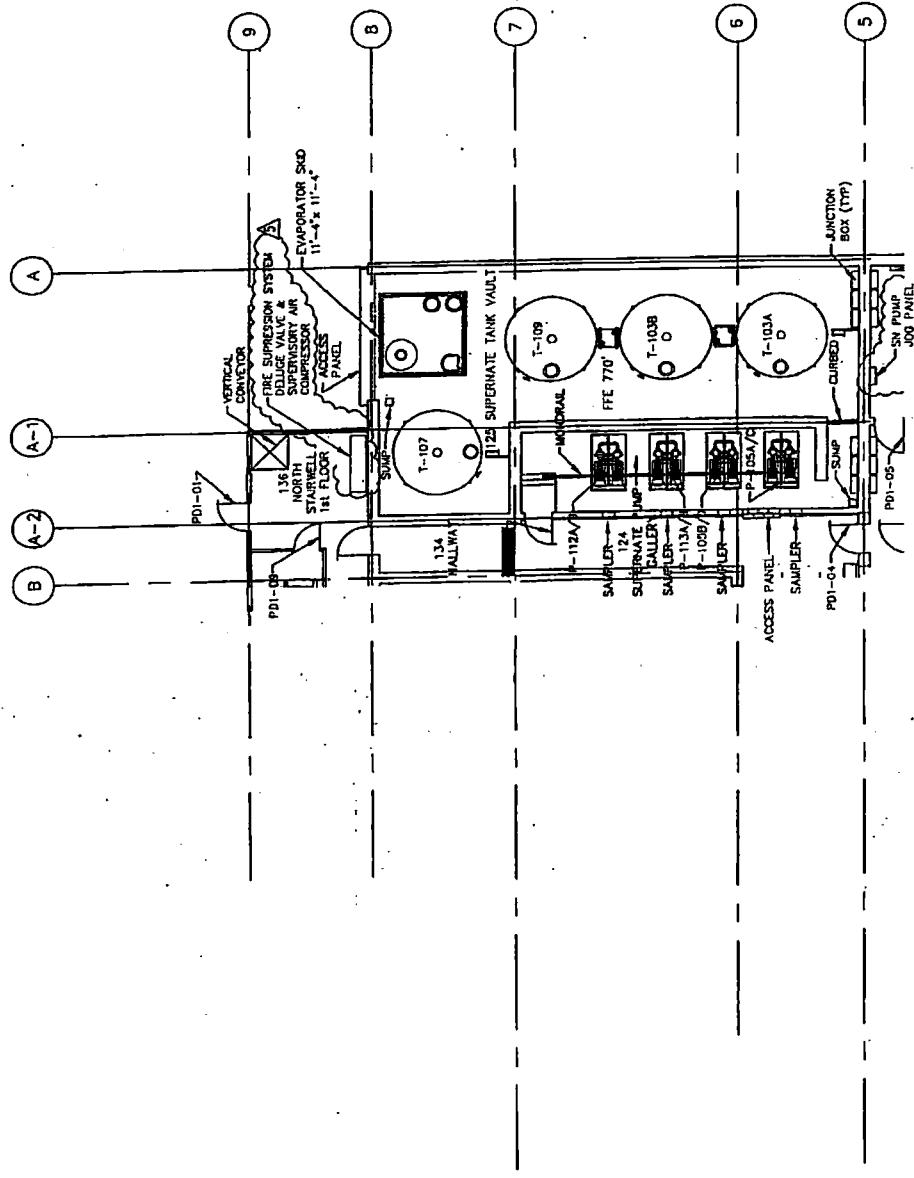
, 1-3, and 1-4 show the floor plans for the 1st, 2nd, and 3rd floors of the PB, respectively.
